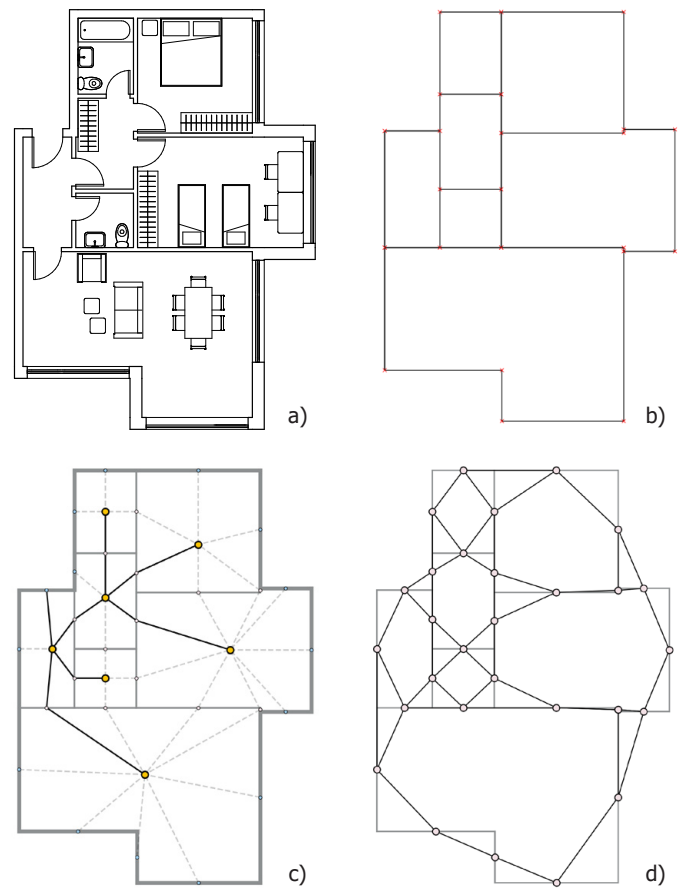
Room and wall connectivity extraction from a simple floor plan
